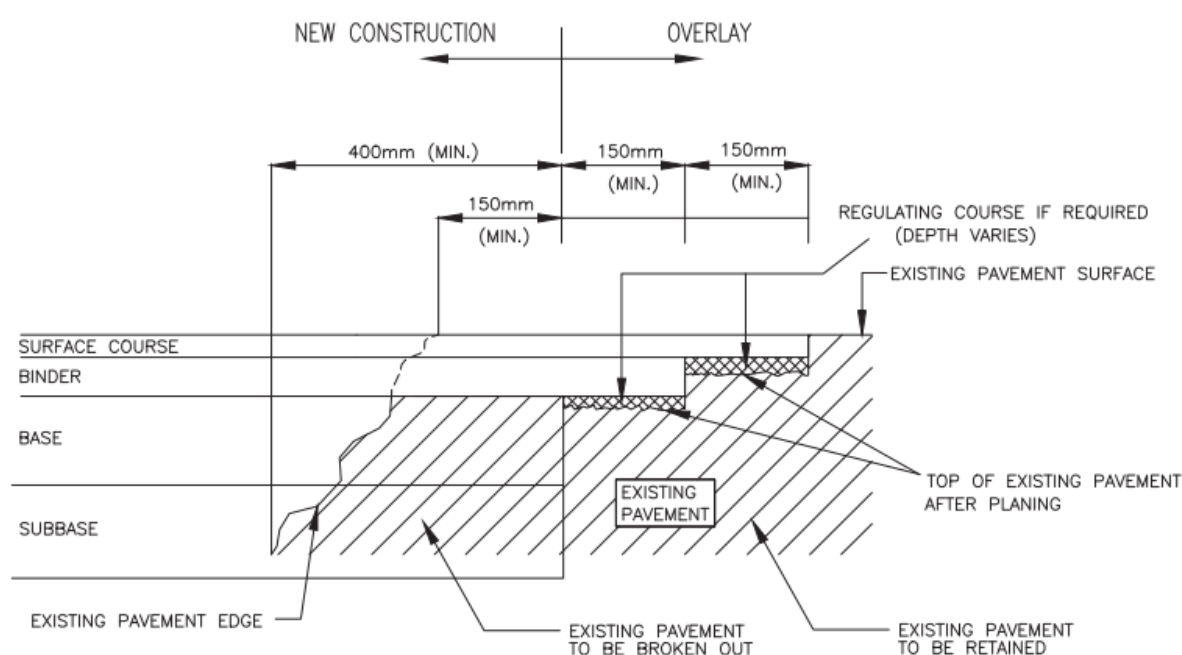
TII - Typical Road Section Longitudinal Tie In with Existing Road
